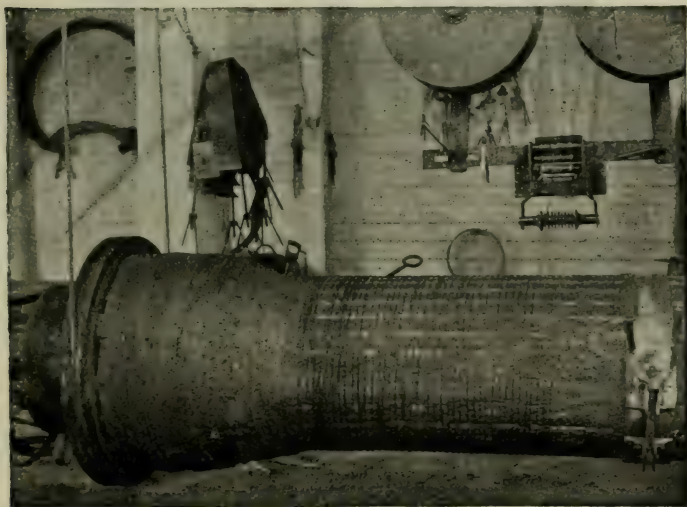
“Siegwart” Helical Reinforcement being wound on Concrete, followed by Concrete Covering.
